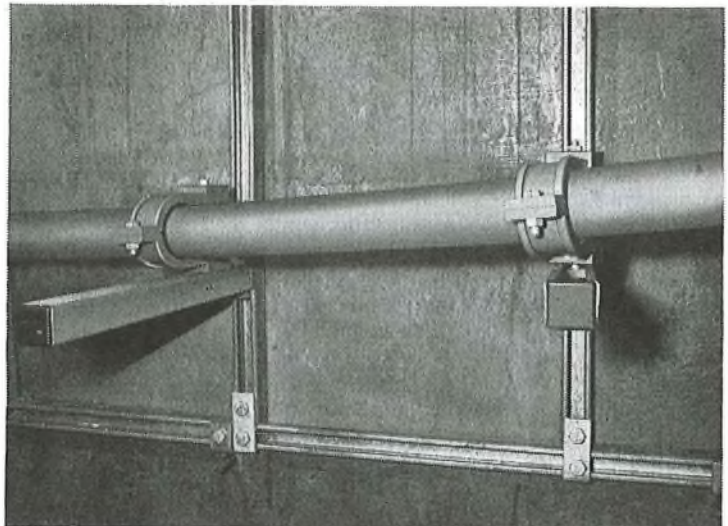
Use of BPO cable cleats on unit-type racking for the support of an 18-pair 60 MHz coaxial cable
